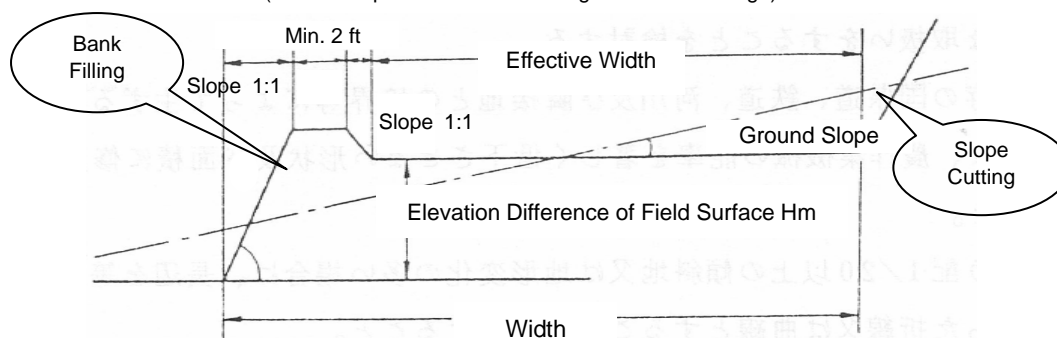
Example of Cross Section of Shorter Side: Cutting and Filling of Slope
